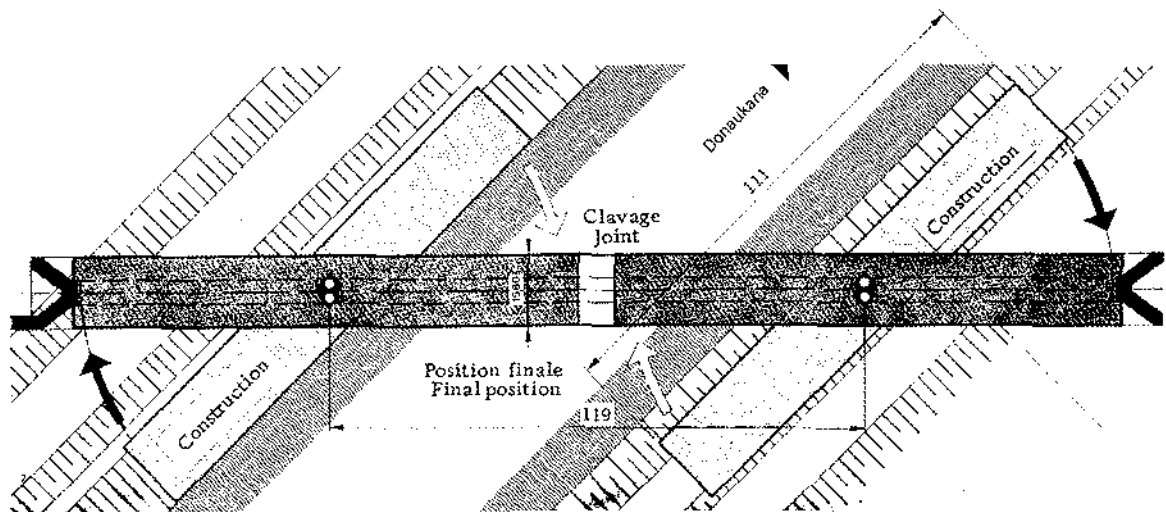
Danube Canal Bridge, plan during construction and final state.
